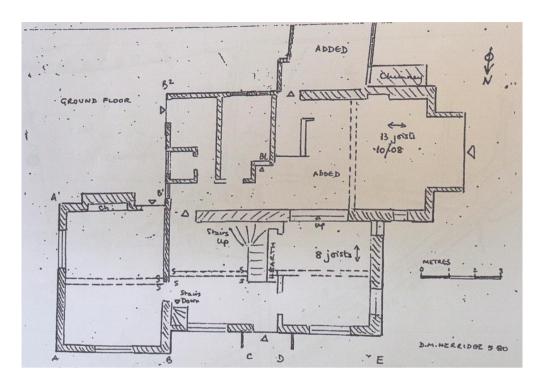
A sketch plan of the ground floor made in 1980 (DBRG (Surrey) report no.2398)
